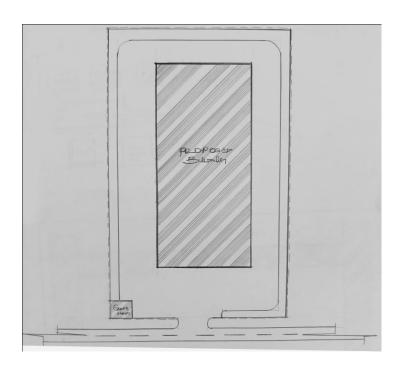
SITE PLAN OF CASE STUDY THREE
